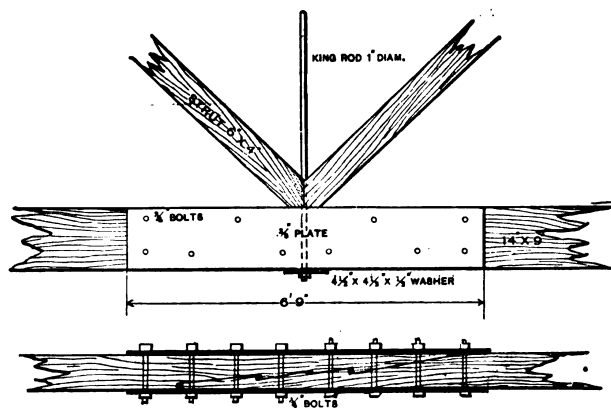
Detail at F of Fig. 1, Showing Side and Top Views of Scarf Joint Secured by Iron Fish Plates.—Scale, ¾ Inch to the Foot.
